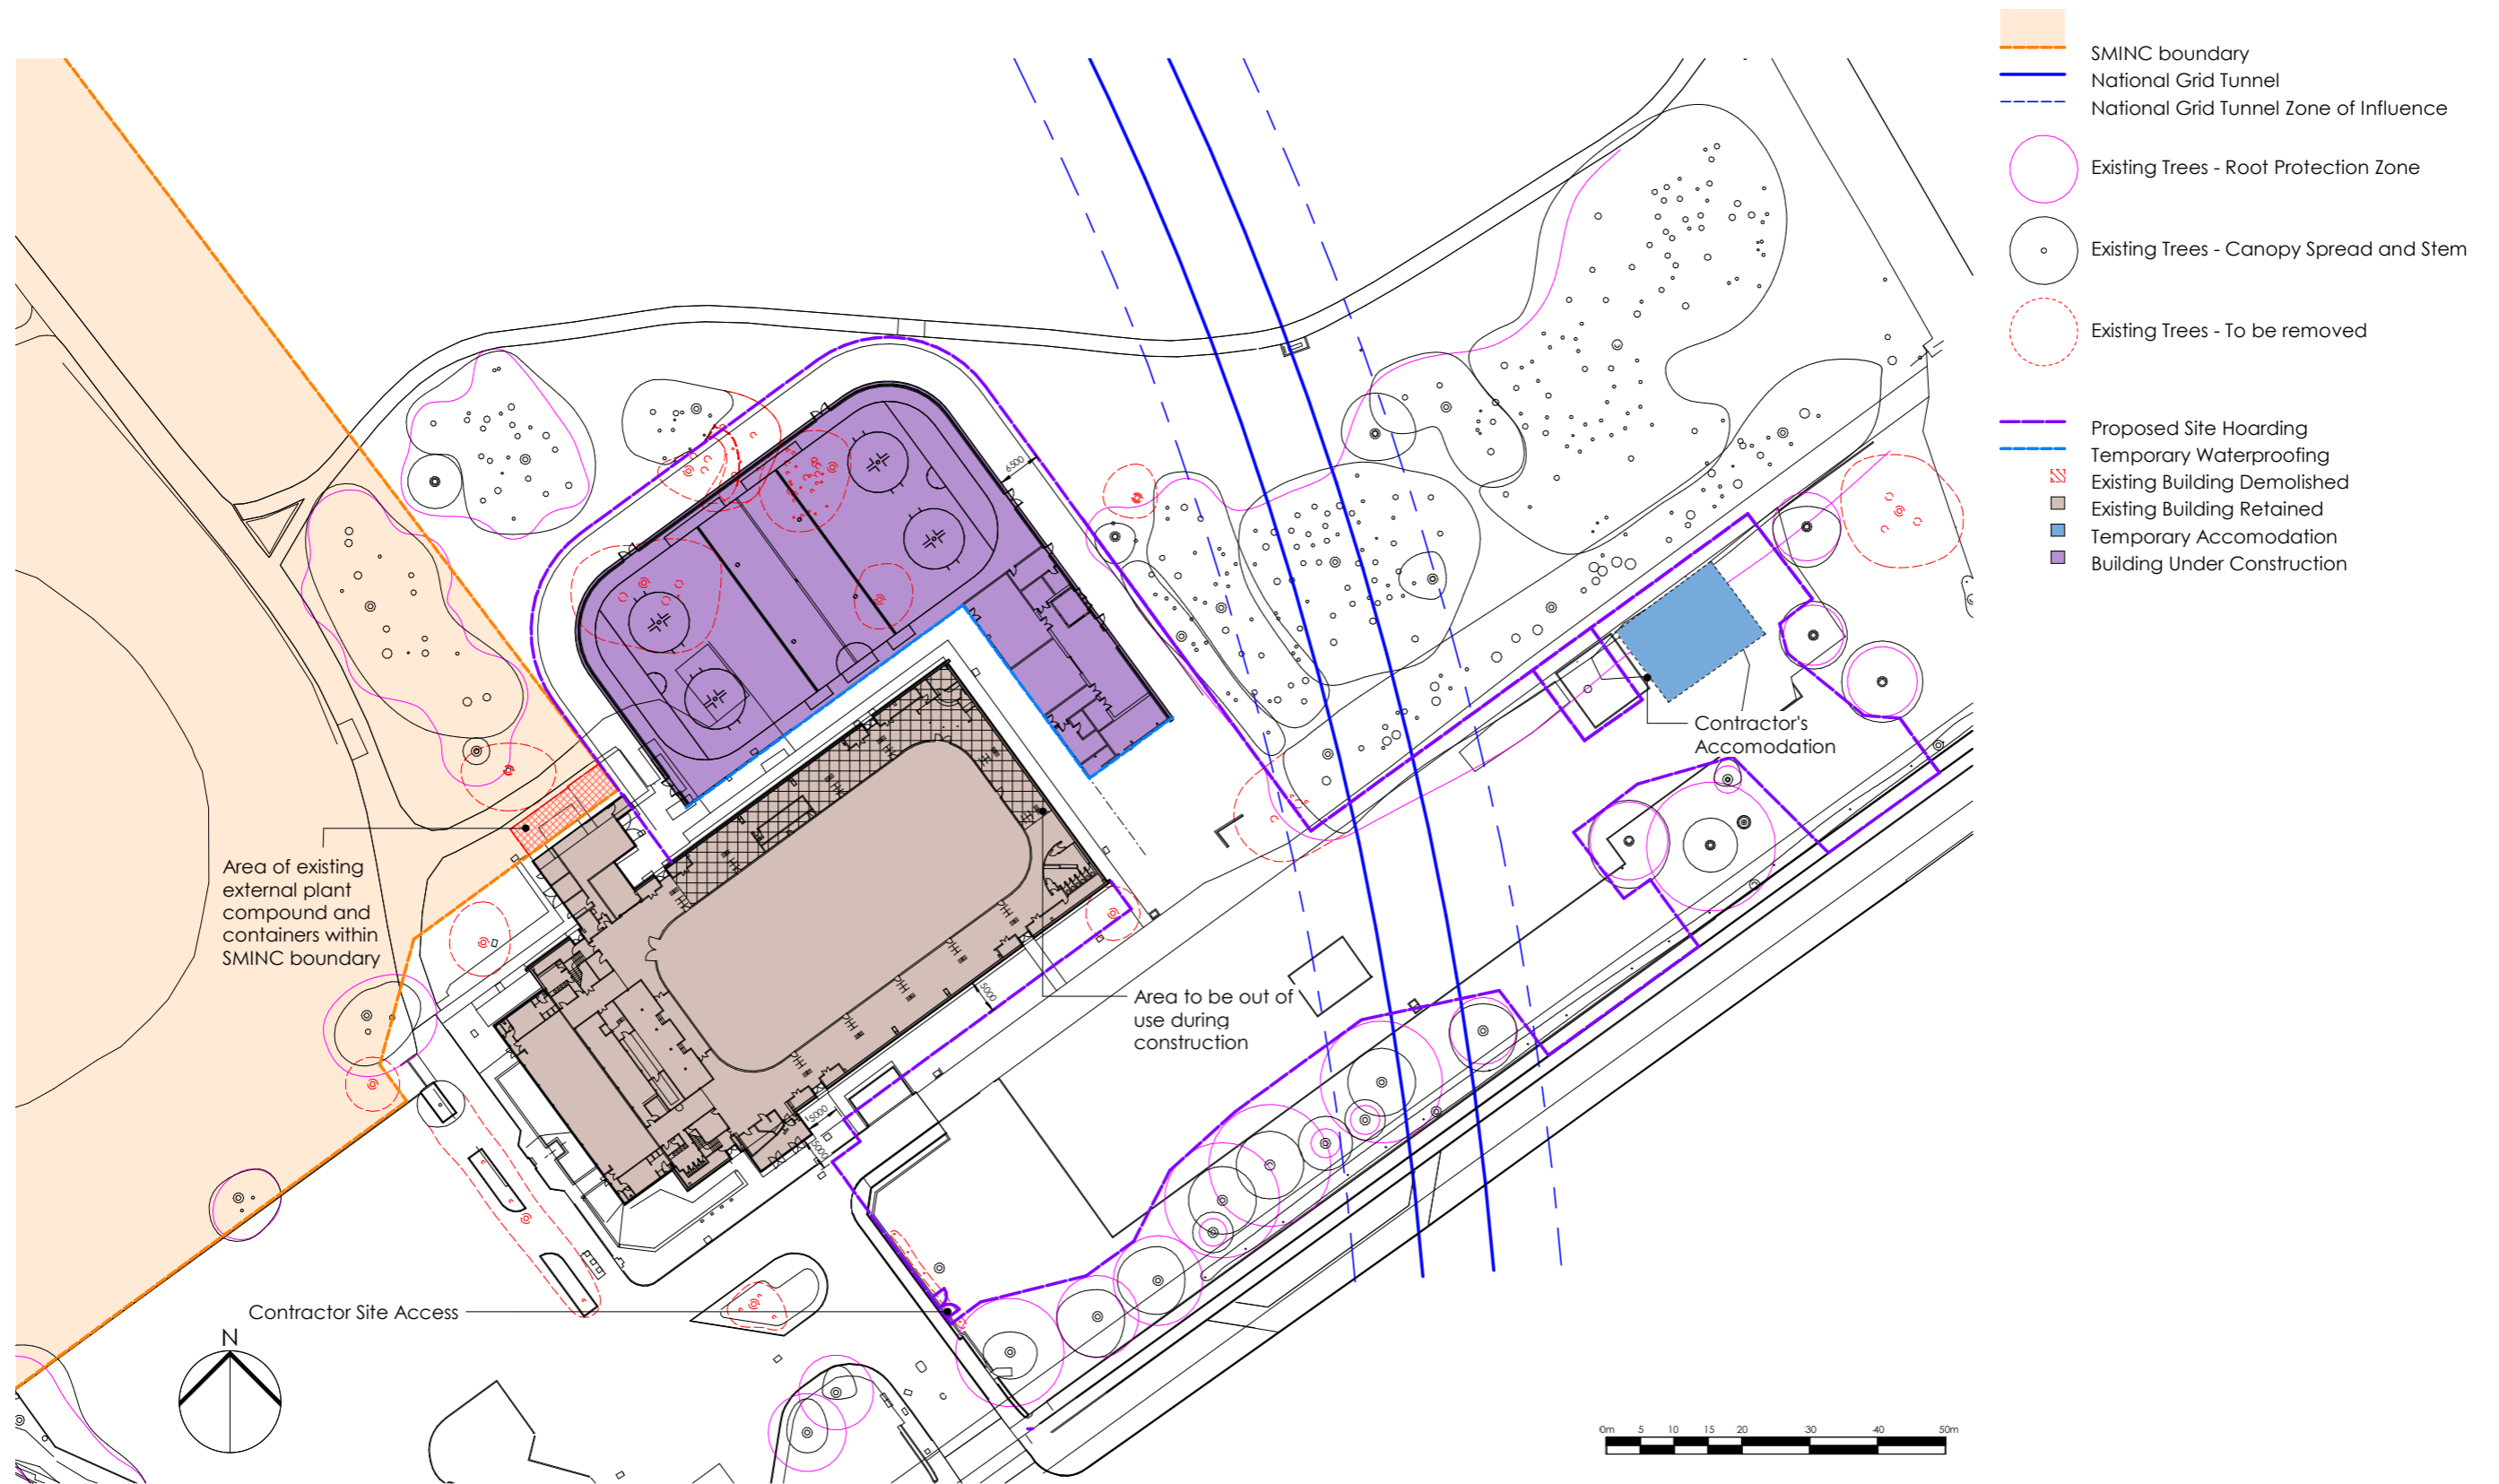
Phasing Strategy and Construction Logistics Plan - Phase 1 Construction (Recreation Pad)
